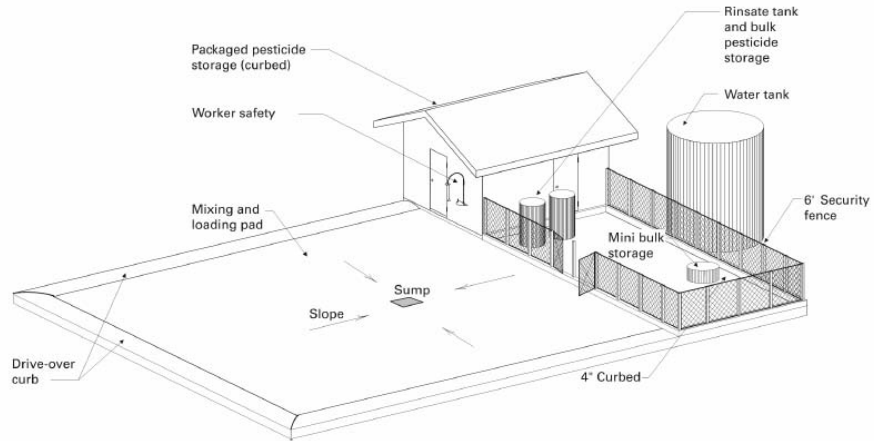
Small-scale facility, perspective view. Optional roof over entire facility.
